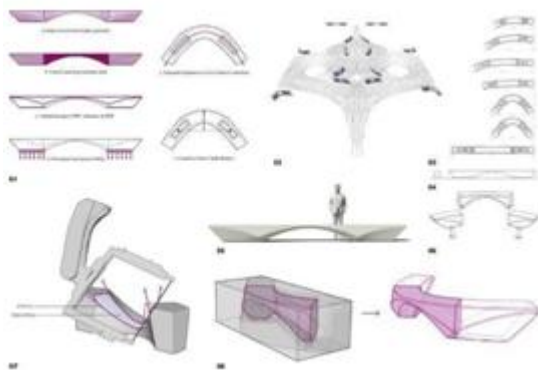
Designing using governed surfaces and cutting objects with a robotic hot-wire cutter 01 In CAGD, use ruled surfaces to determine the geometry. 03, 04, 06 Using a bespoke BIM tool, design development, drawings, schedule, and so on. 02, 05 CG pictures of all the benches as well as a single person. 07, 08 Ruled geometry hot-wire cutting by robot. (Photo credit: Zaha Hadid Architects)
